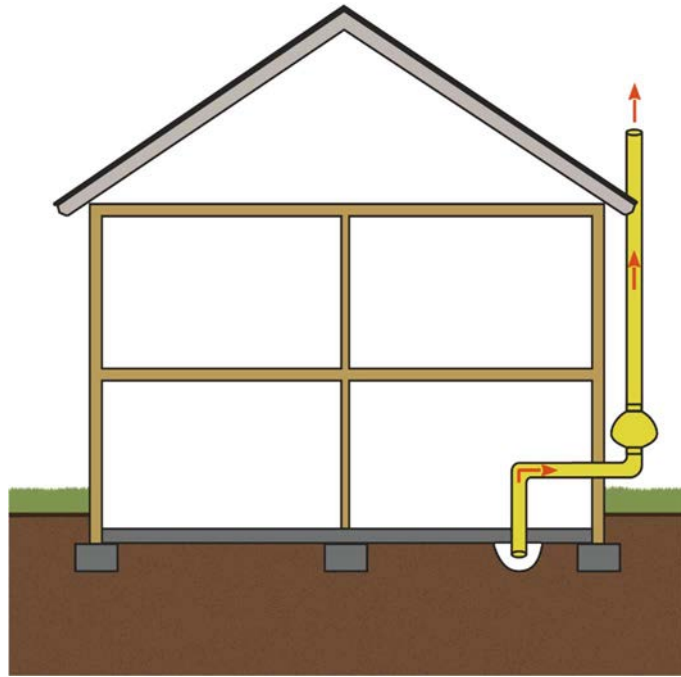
Sub-slab depressurization with fan external to building and roof level exhaust.
